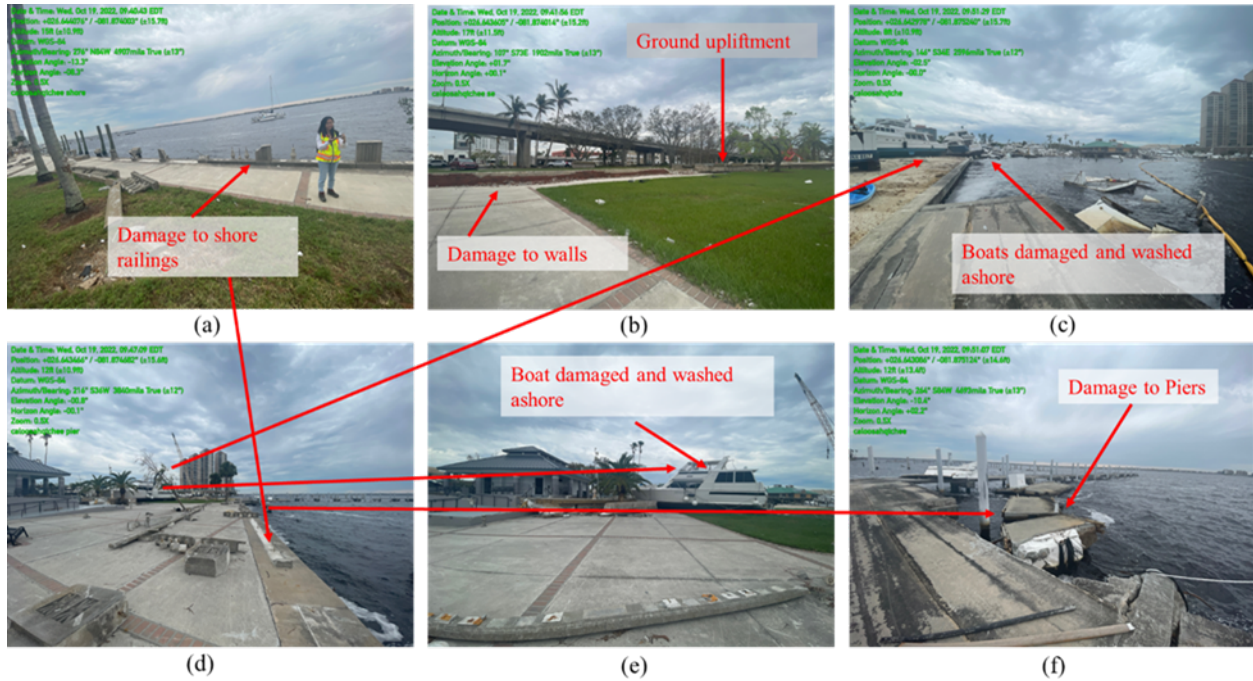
Surveying around Centennial Park, Downtown Fort Myers: (a) Damage to shore railings; (b) Ground upliftment and damage to walls near the Cleveland Avenue; (c) Damaged boats washed ashore due to the storm; (d) Damage to railings; (e) Boat damaged and washed ashore; (f) Damage to piers with severe damage to the foundation. Coordinates: 26.64375, -81.87416
